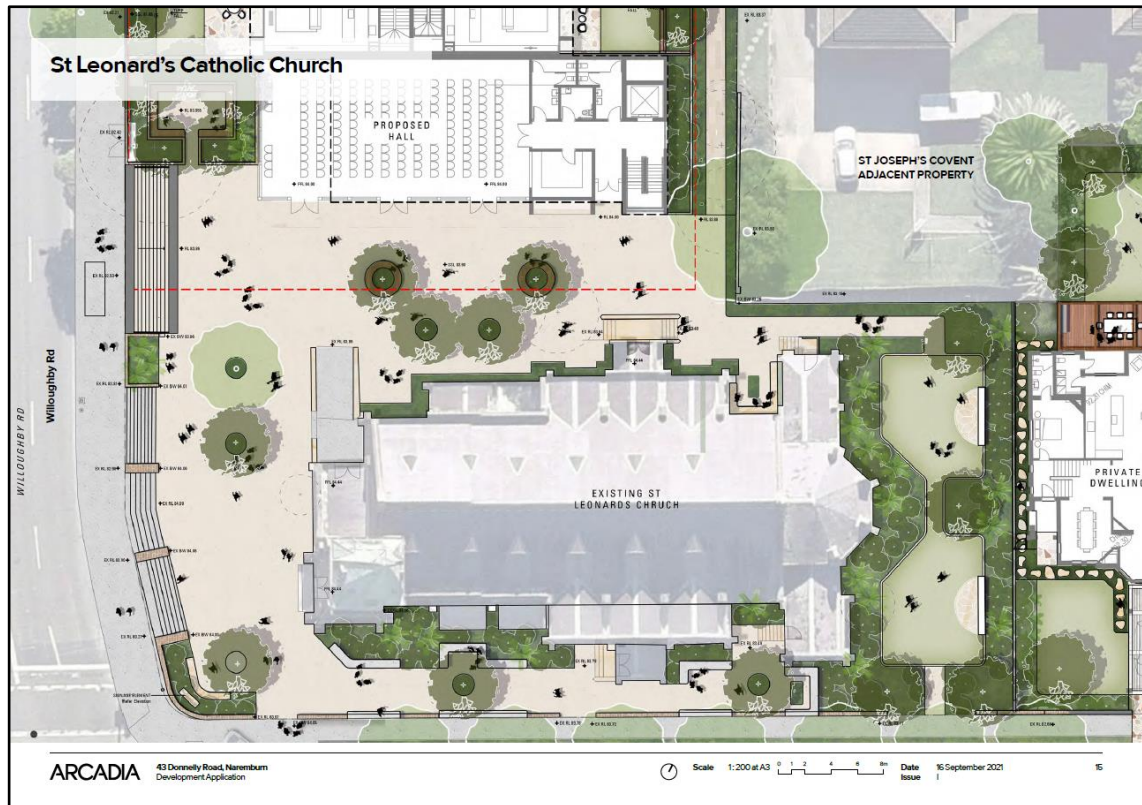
Proposed landscape details around St Leonard's Catholic Church.
